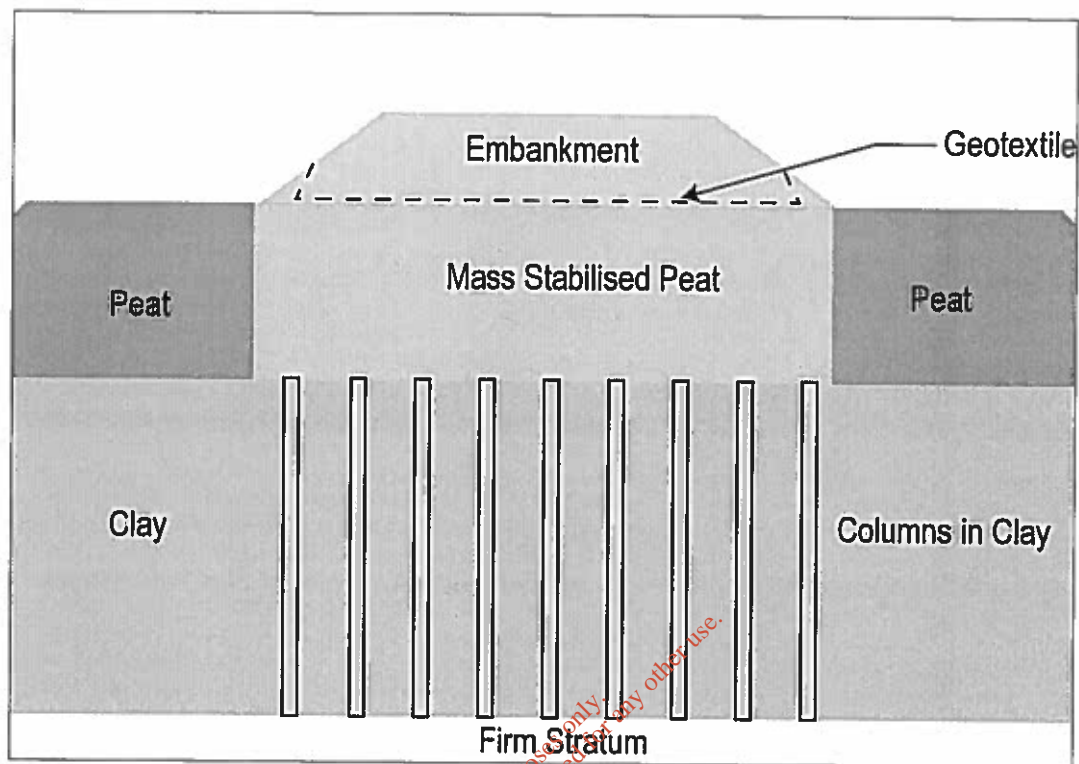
Combined use of mass stabilisation and stabilised columns for a road embankment.
